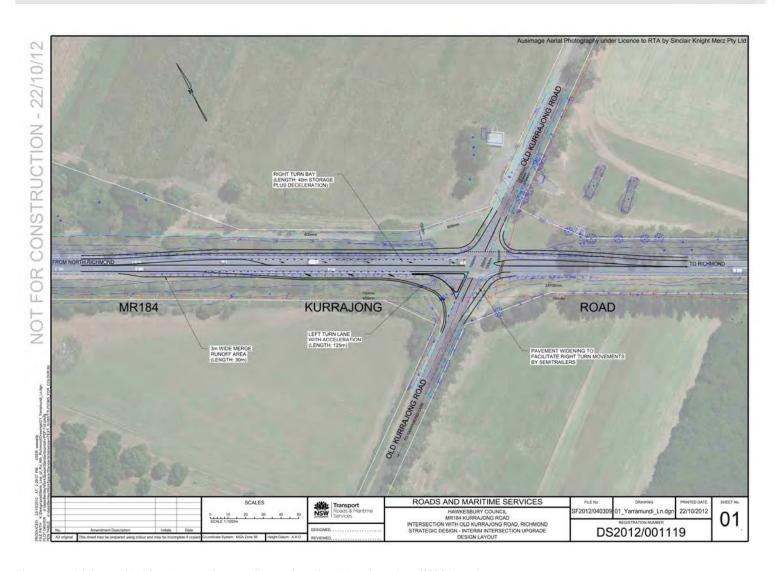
Richmond Bridge Approaches study area location, Kurrajong Road/Old Kurrajong
